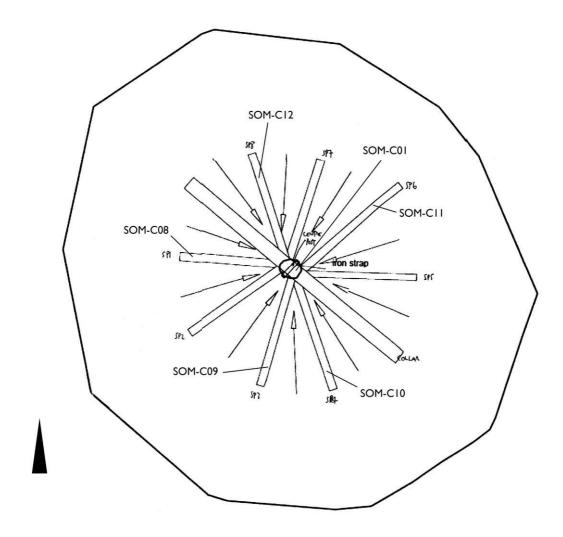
Plan of the tower timbers, showing the location of samples SOM-C01 and SOM-C08–12 (after Hoare Ridge & Morris)
